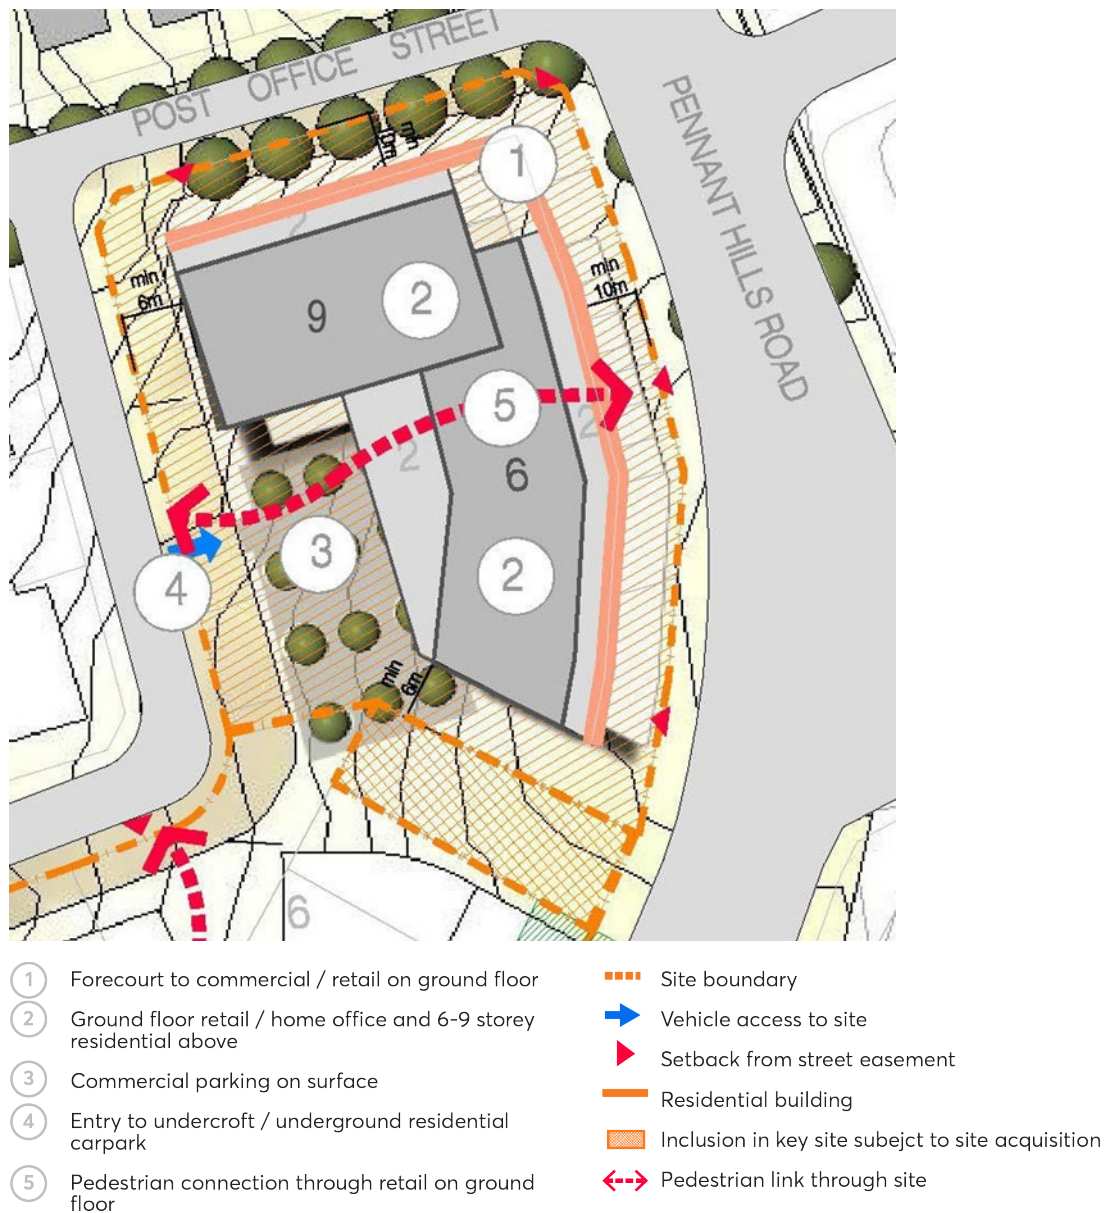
Dimensional Built Form Controls: Block 16 Corner of Pennant Hills Road and Post Office Street
